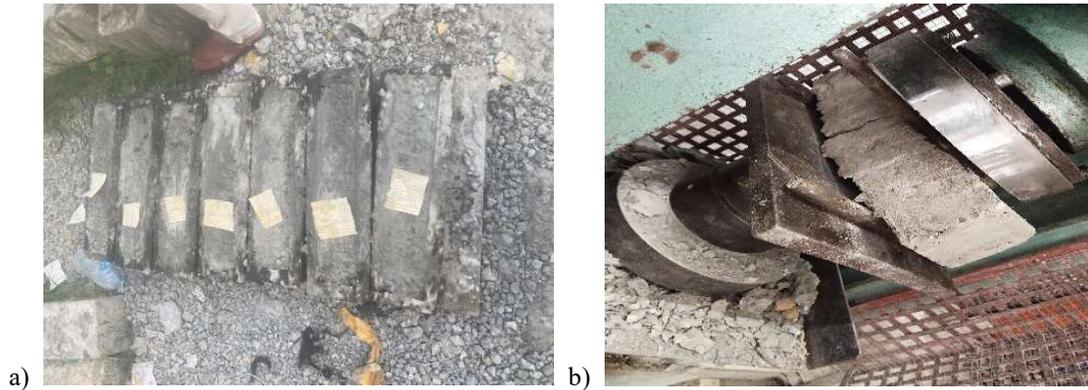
Beam, a. casting of the beam, and b. testing of beam
